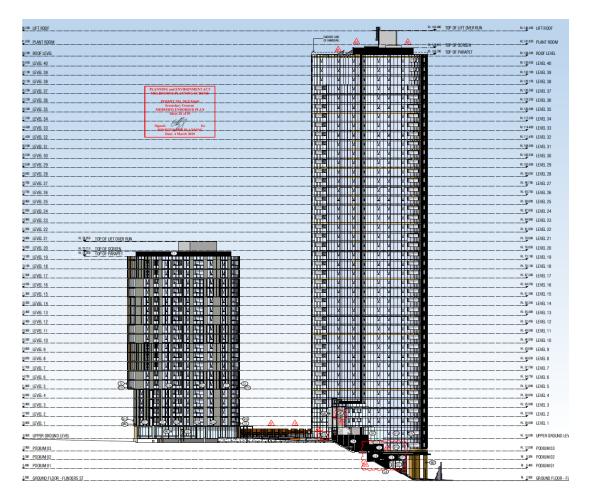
West elevation of approved R1 (right) and R3 (left) buildings. From Drawing TP204
